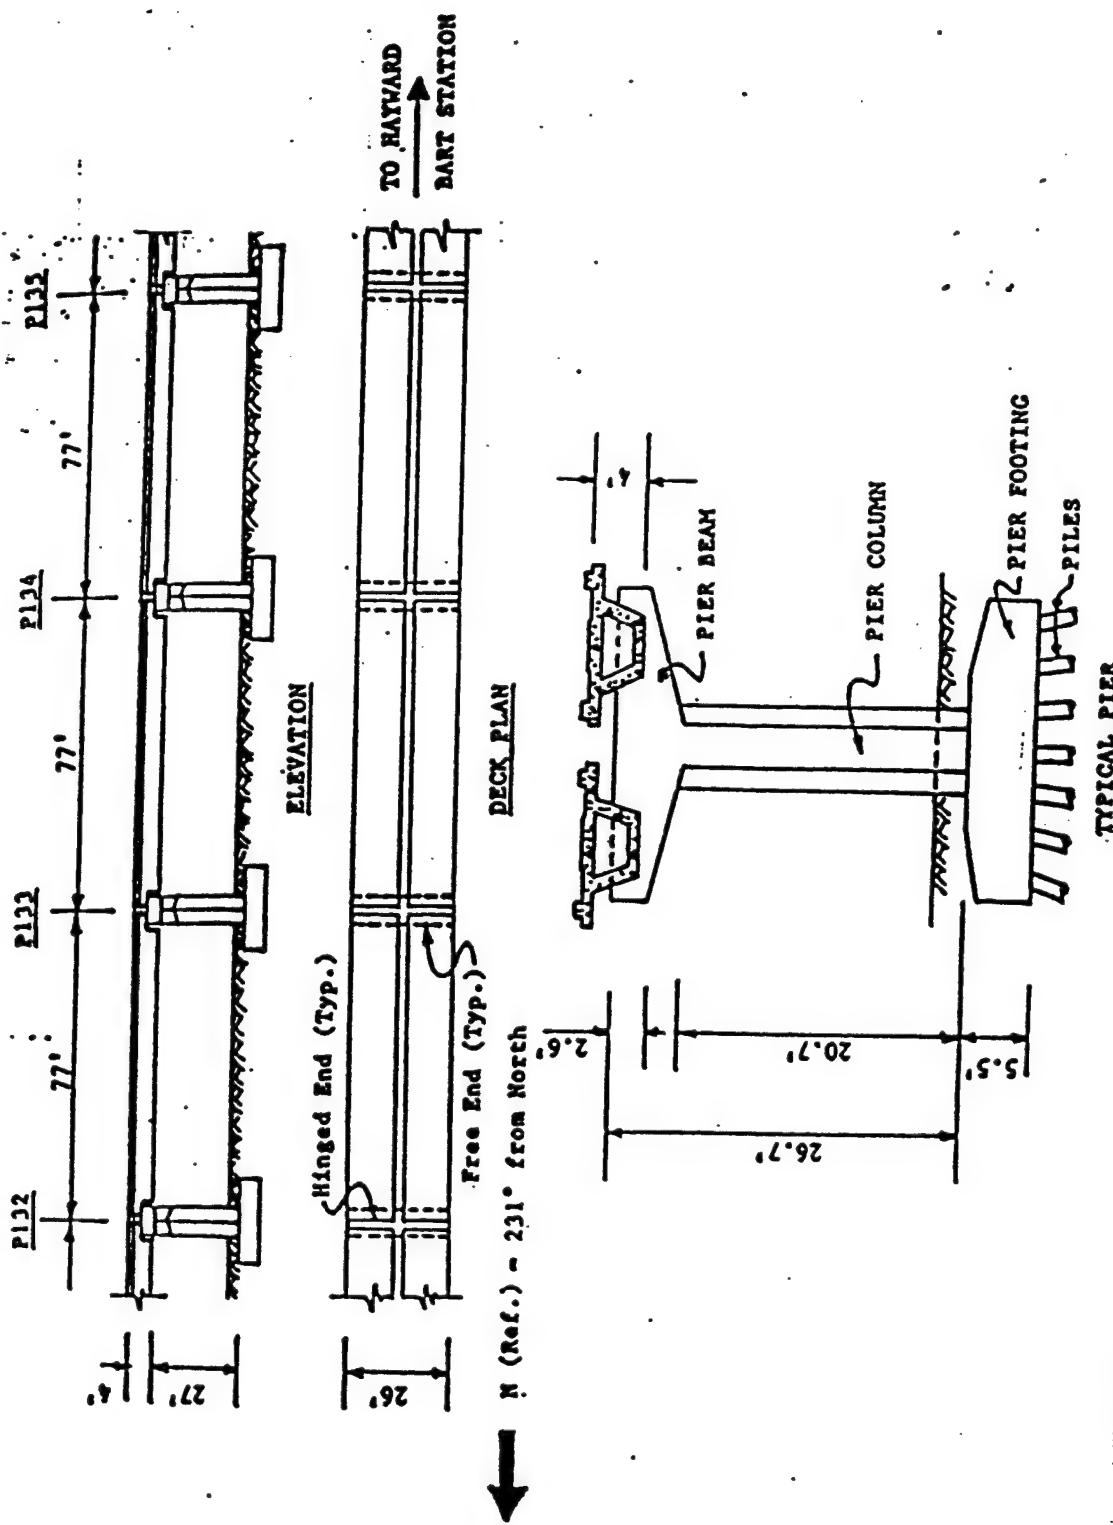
Structural Configuration and Dimensions of the CSMIP-instrumented Section (From: Tseng, 1992).
